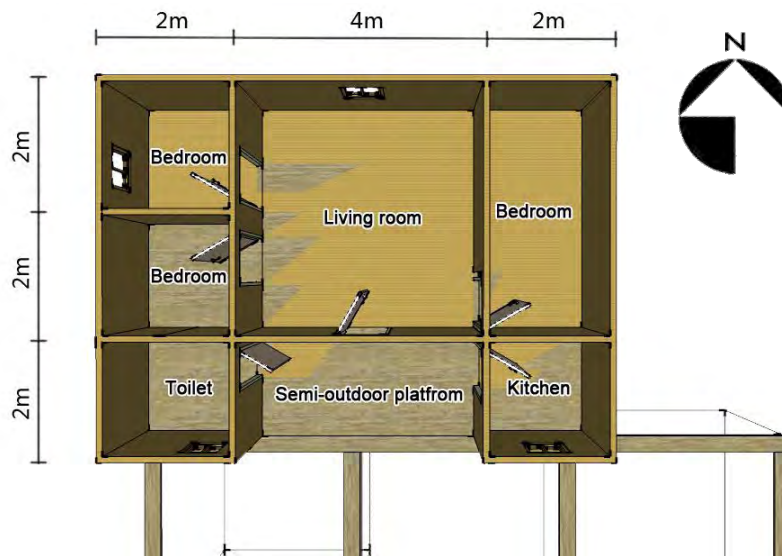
The building plane of cabin in fish rafts(Source:by author)
